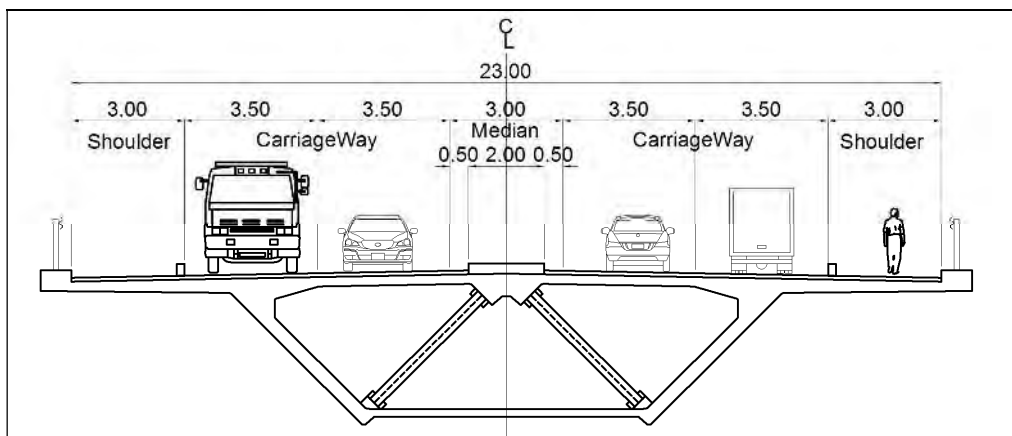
Typical Cross Section of Cable Stayed Bridge of RR3
